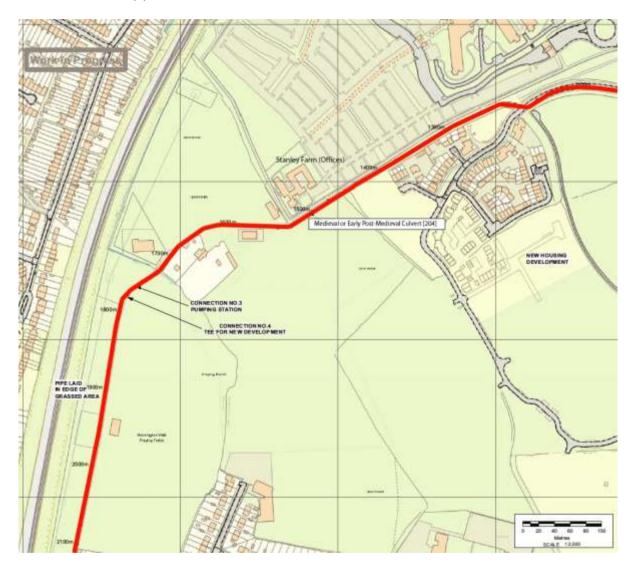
Scheme location plan showing area of groundworks monitored at Stanley Farm/Bonnington Walk
